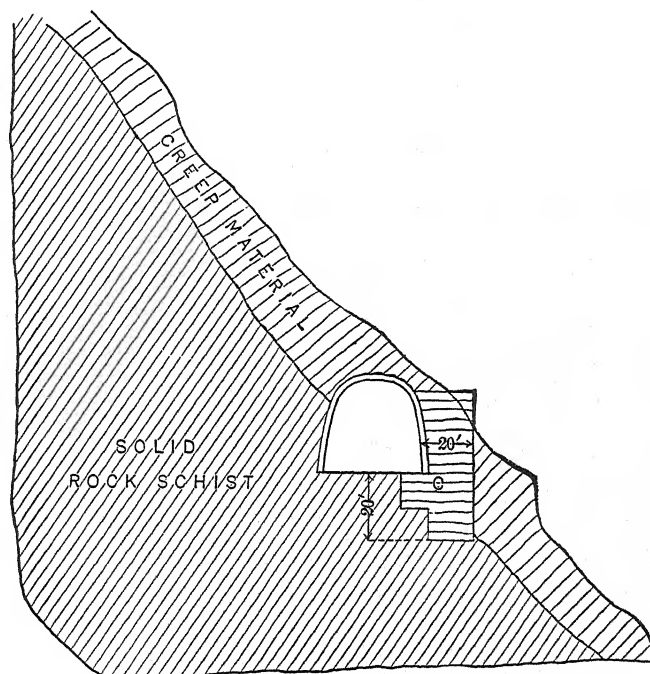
Section showing position of Mühlthal tunnel and creep material on Brenner Railroad. (After Drinker, Tunneling.)
